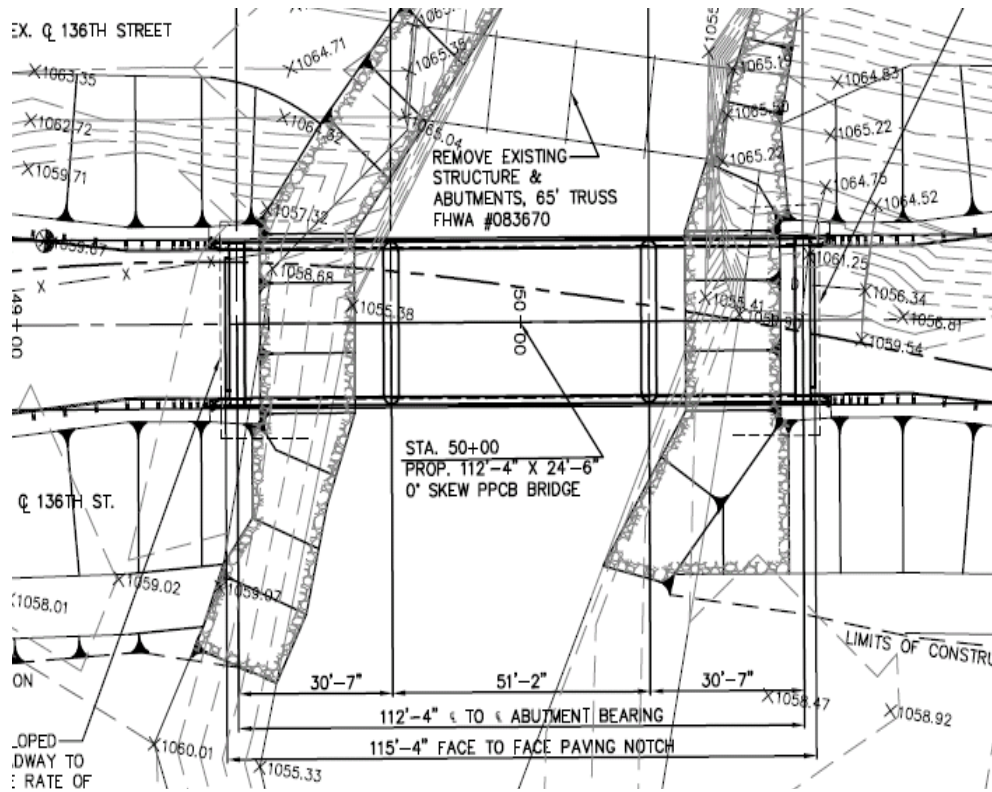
Situation Plan of Buchanan County Pi Girder Bridge-(Keierleber, et al. 2008)
